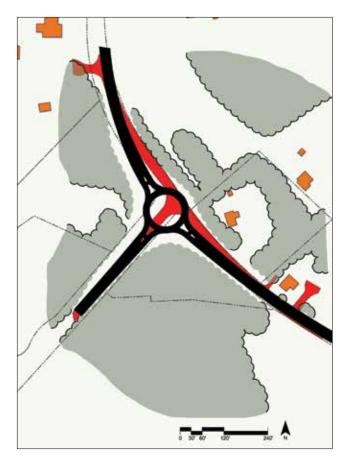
Diagram of potential realignment of the Duley Station Road and Croom Road intersection with a roundabout insertion: red indicates existing road alignment, black indicates potential realignment
